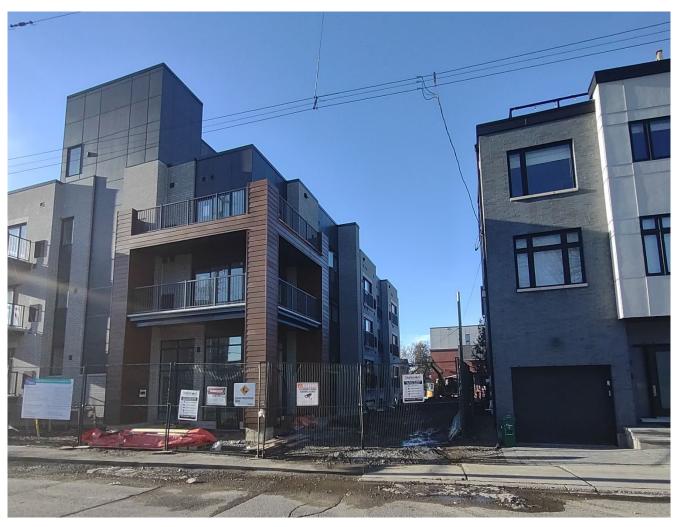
Looking north at 177 Armstrong Street and the drive aisle that will provide vehicular access to the proposed development at 266 Carruthers Avenue.
